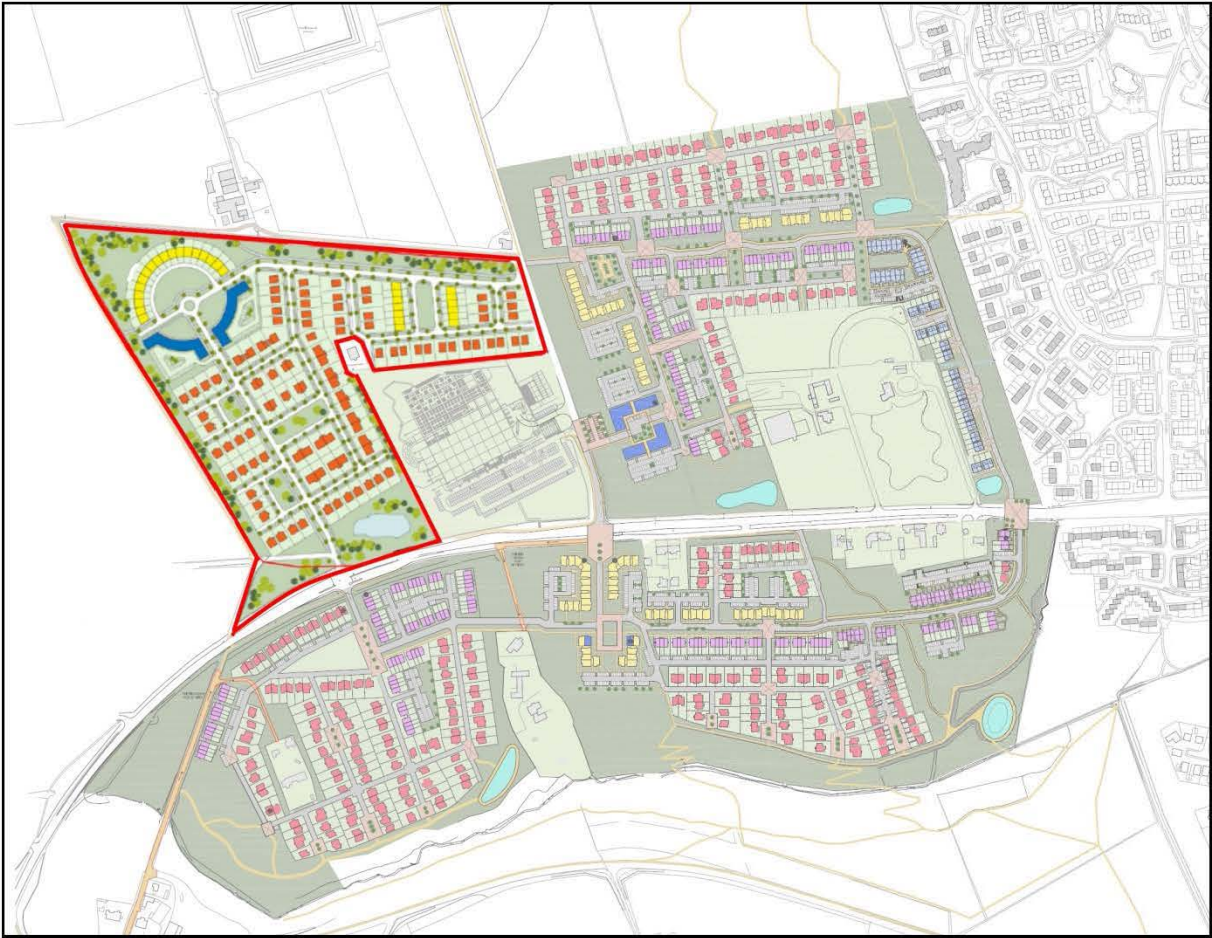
indicative plan and interface with the adopted Maiden Craig masterplan area.
